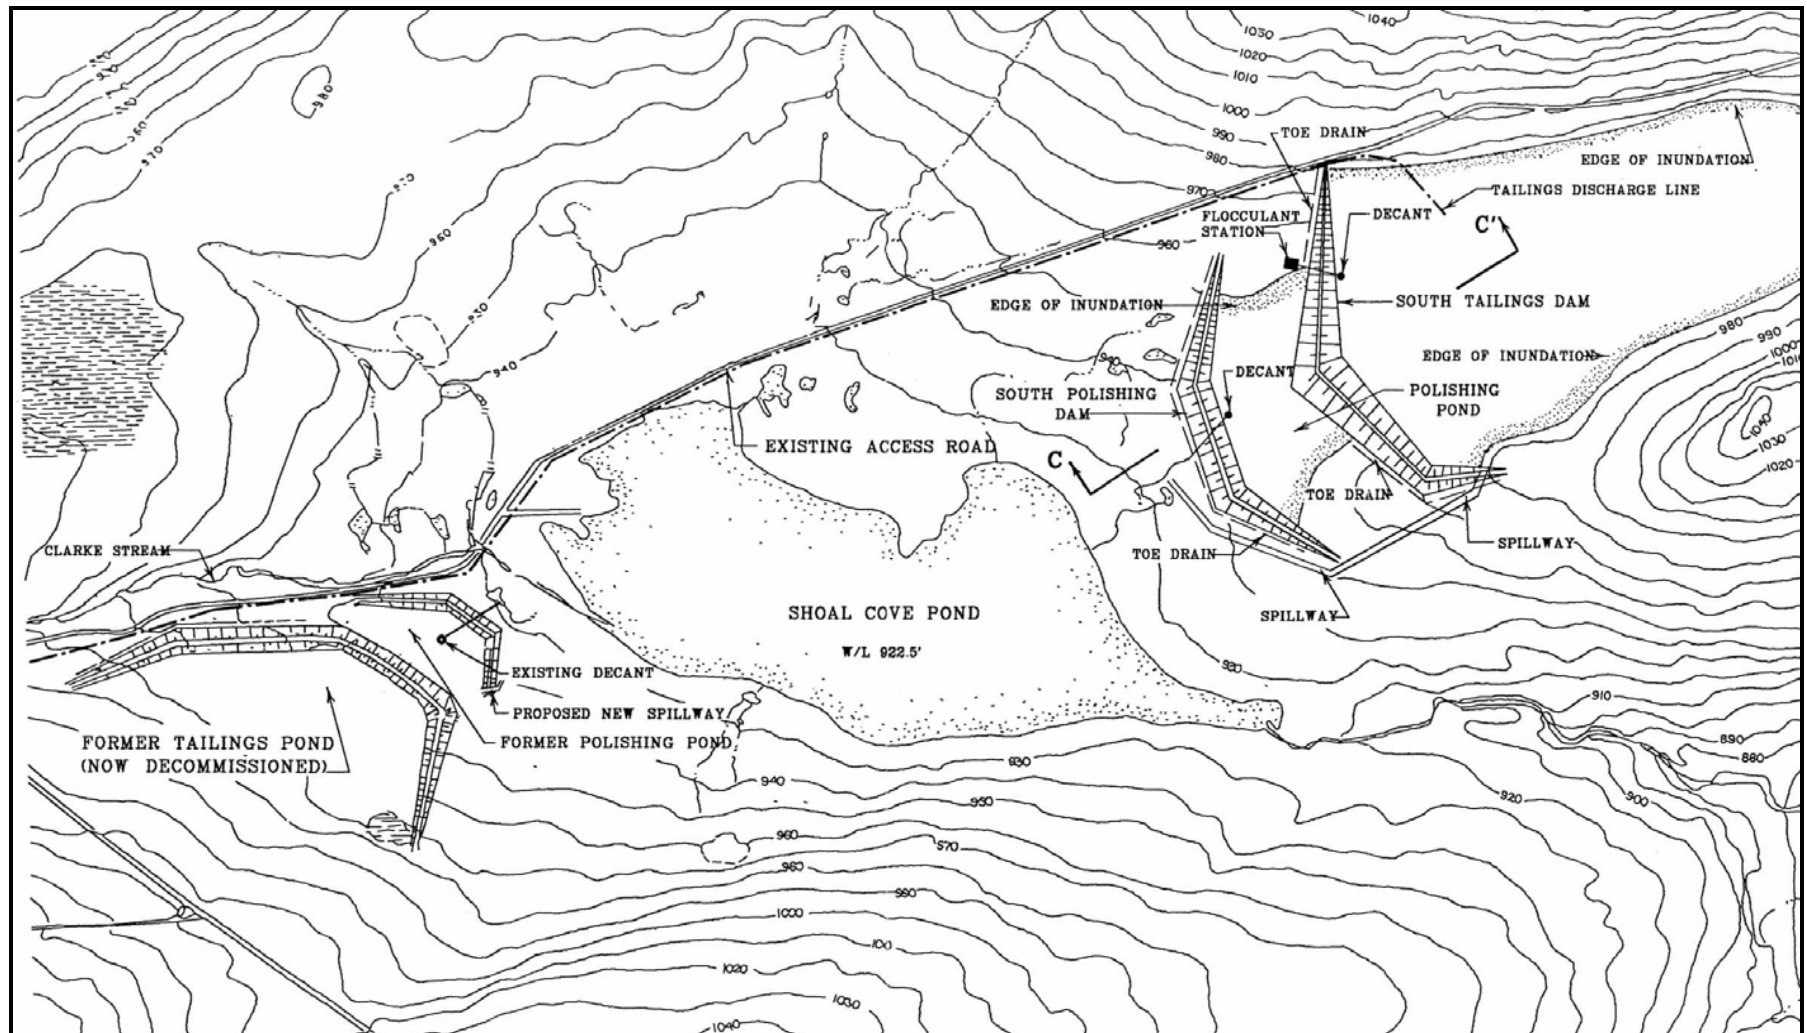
Hillside Tailings Disposal Alternative (south end of Shoal Cove Pond)
